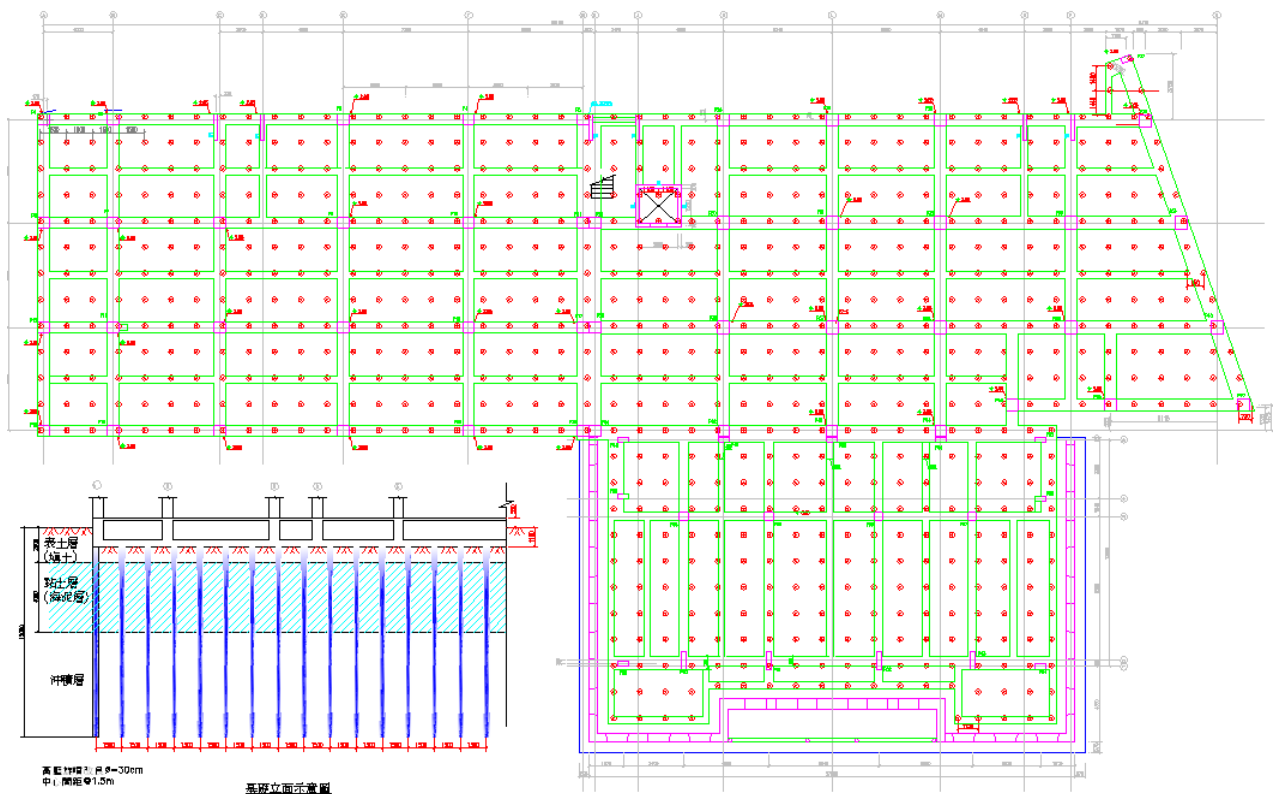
Plan of jet grouting (jet grout piles shown in dots)
